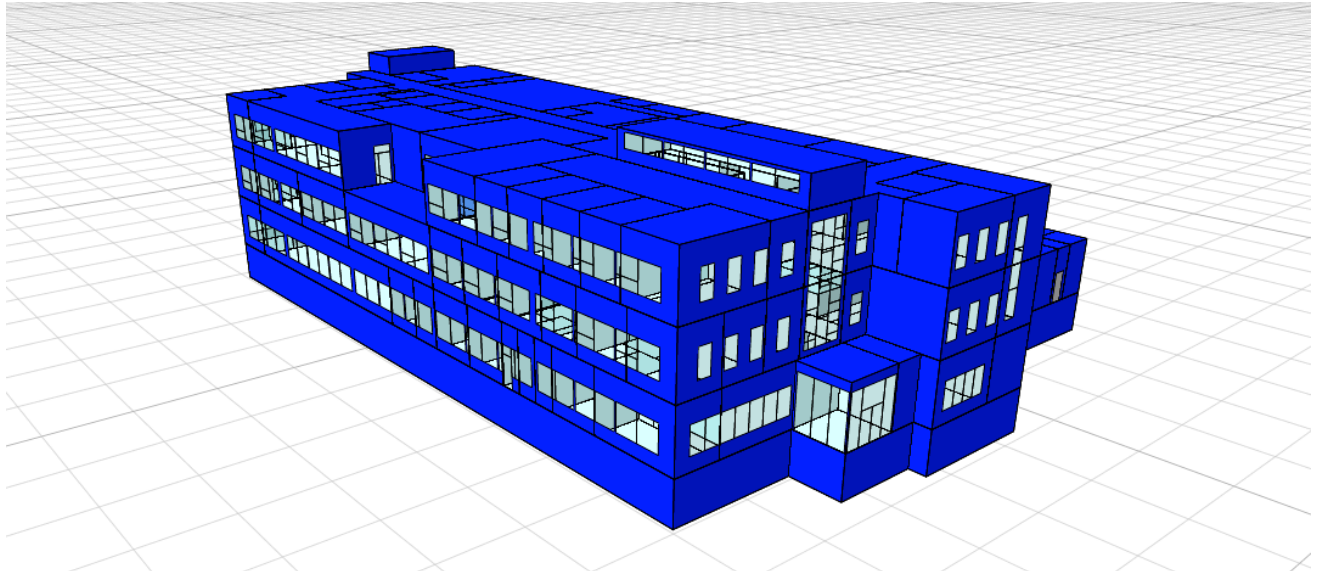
Initial North Cowichan Civic Building design as modeled in IES<VE>, viewed from the Northeast.
